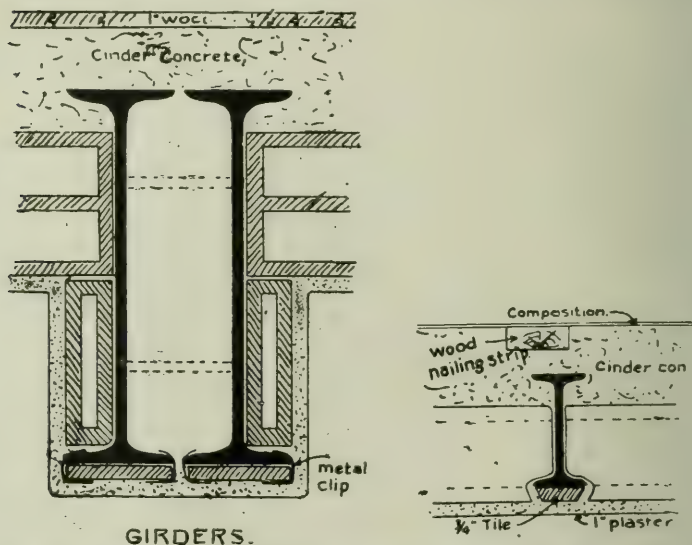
Defective Fireproofing of a Girder—commonly used because of Simplicity of Construction for decorative Purposes.
